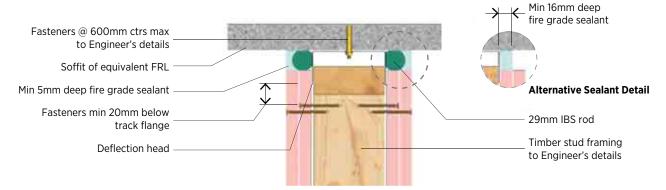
Standard Timber Stud Wall - Deflection Head Detail
